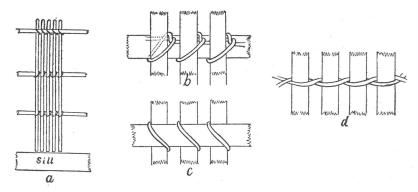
Latticework walls made with *purau* rods or bamboo: a, inside of wall; b, detail of wall, inside; c, detail of wall, outside; d, rods held with twined *ieie*.
